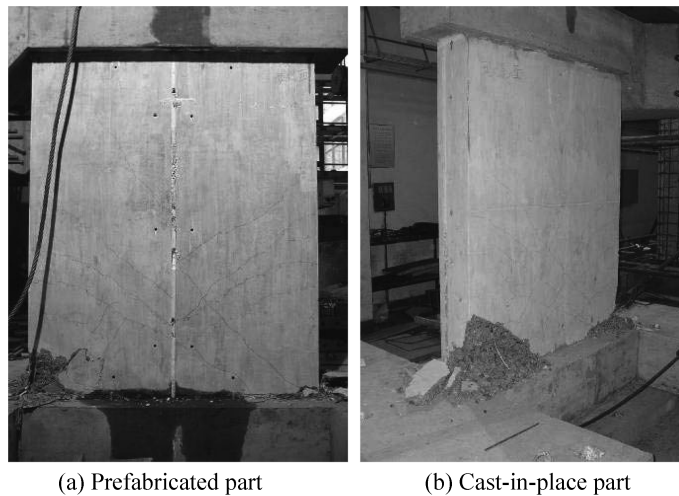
Crack distribution and failure mode of the composite wall with a slit
